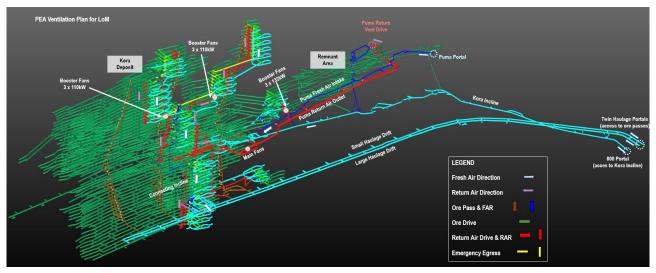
LOM Ventilation Plan Profile Facing Northwest
